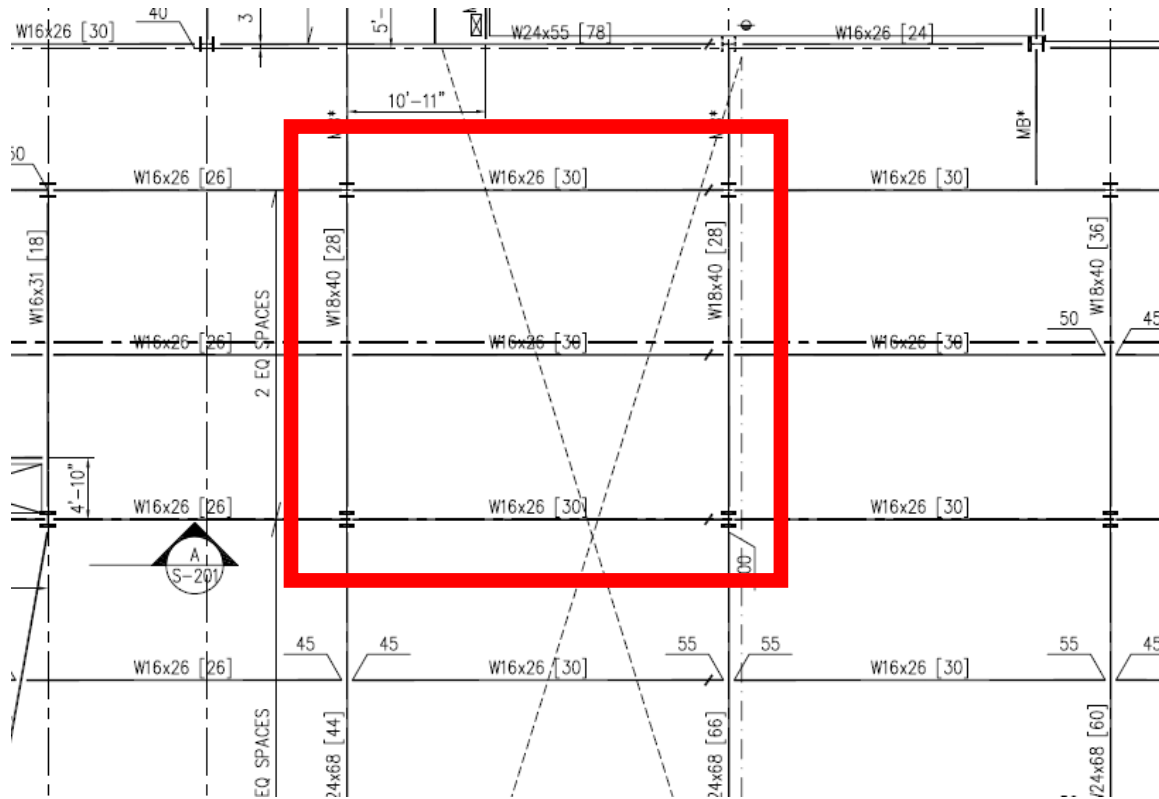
Typical 30'-0" by 25'-10" interior bay used to design the alternative floor systems
